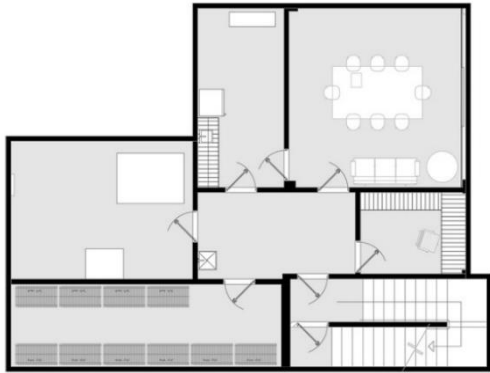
GROUND FLOOR PLAN (TERA) (Arquitectos, 2015)
